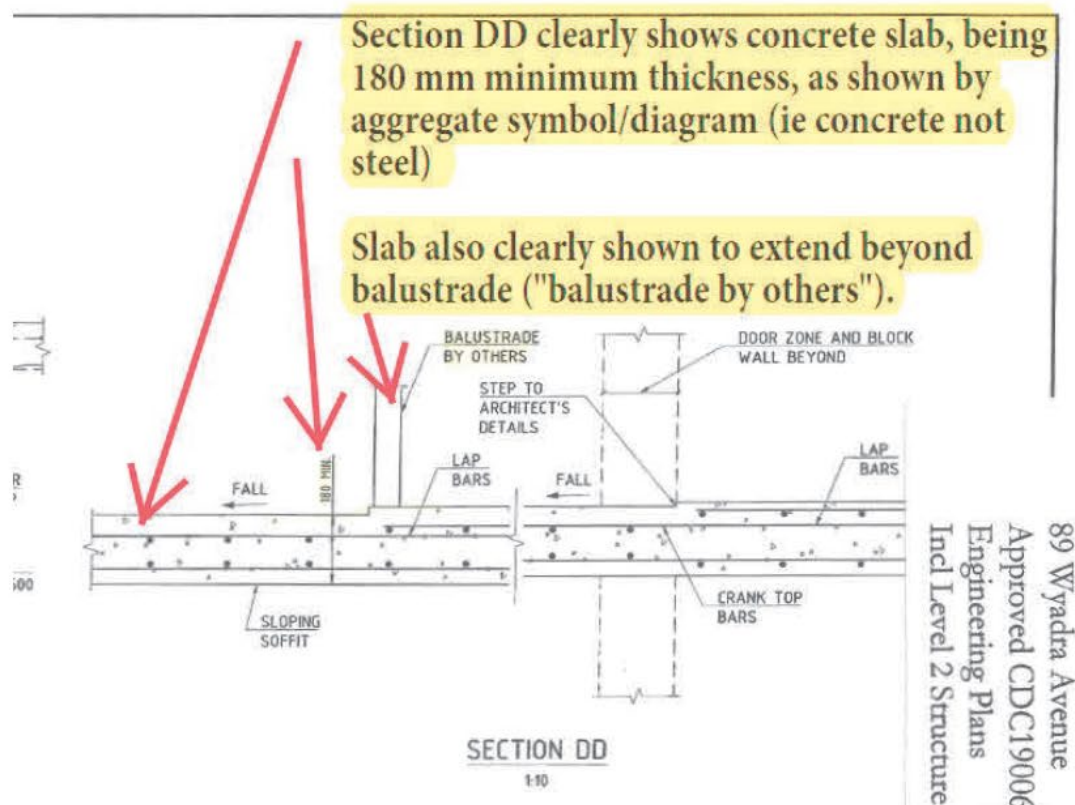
Approved CDC2019/0461 Engineering Plan No. S06 Section DD with Applicant mark up
